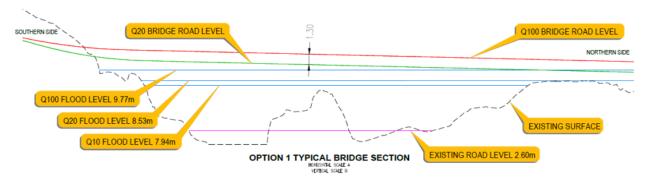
Typical Bridge Section and Flood / Bridge Levels
